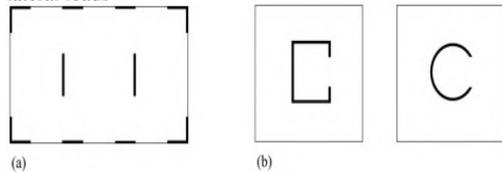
(a) Shear trusses / shear walls in plan, (b) partially closed cores in plan
